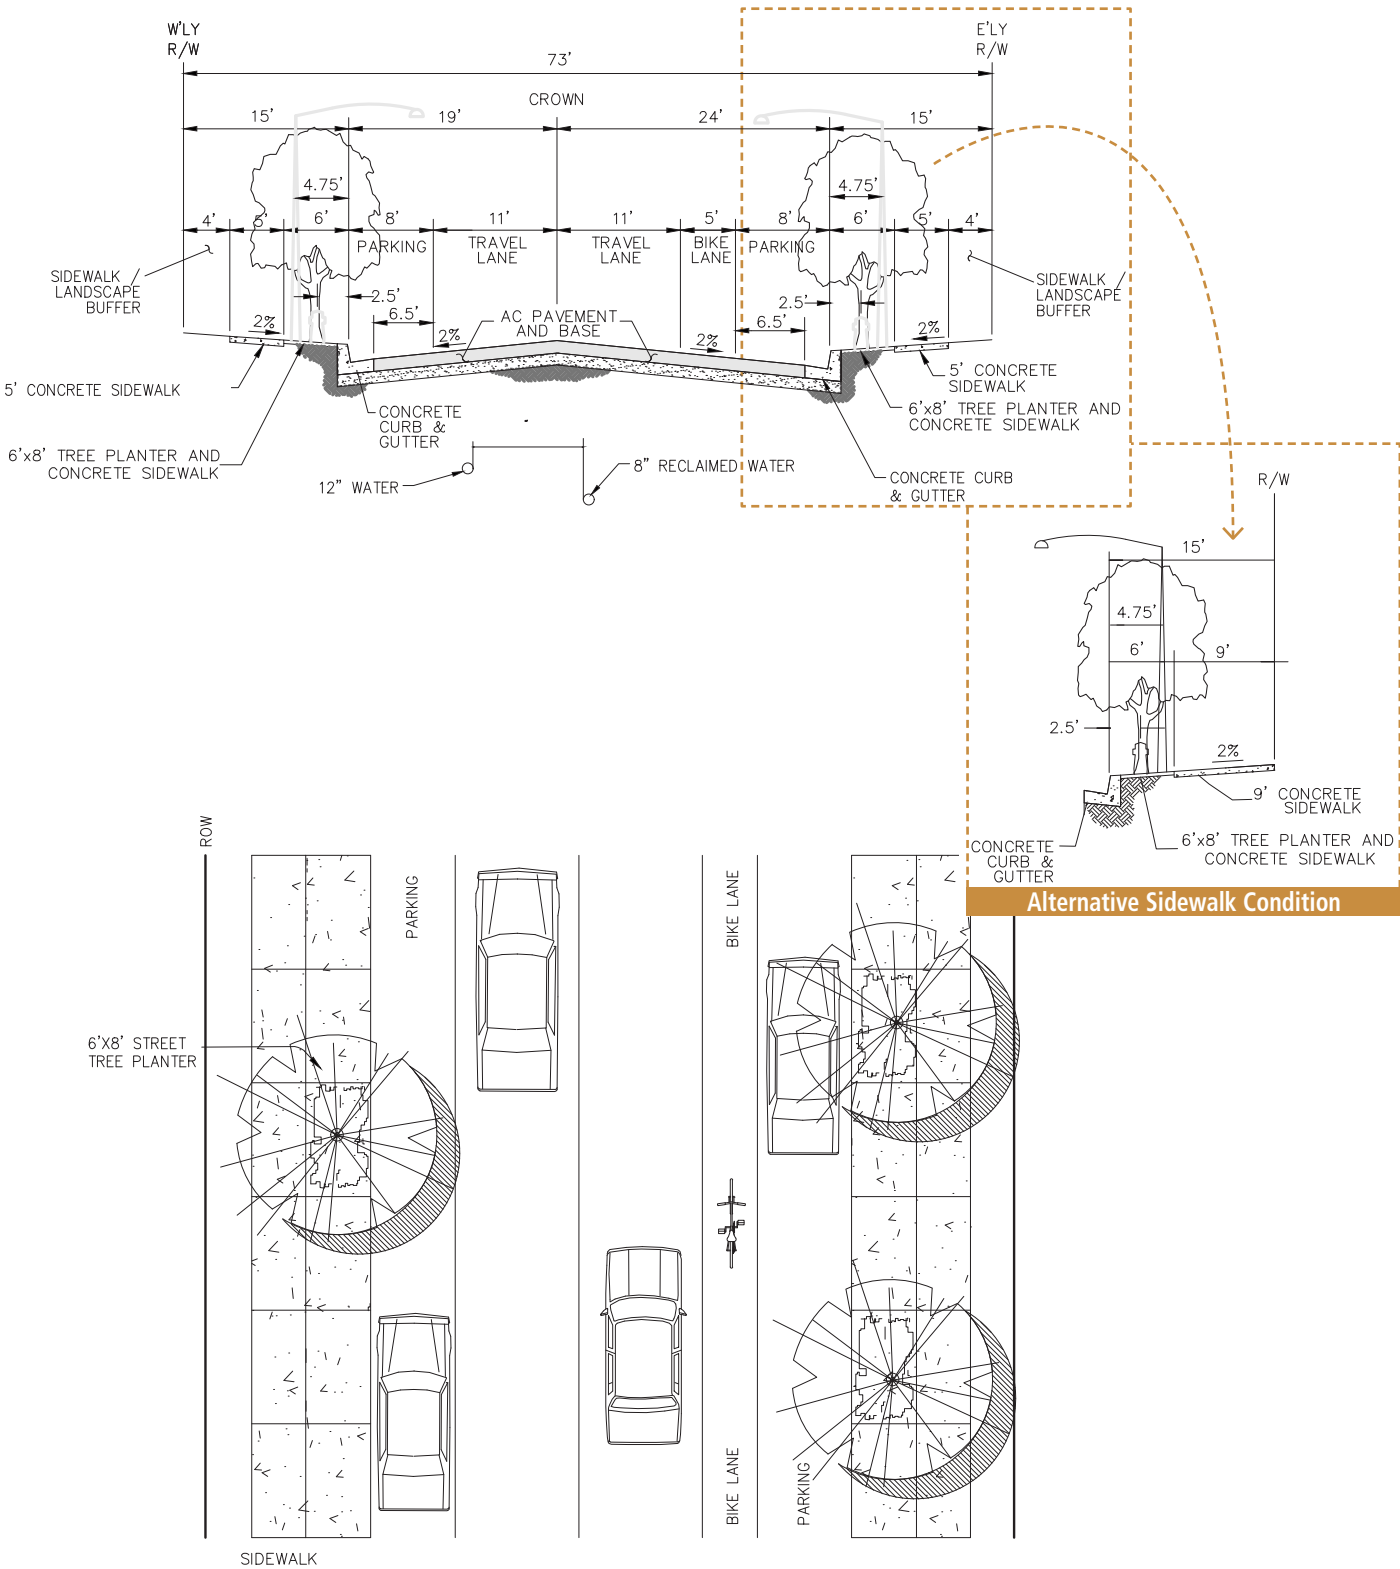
Northbound La Media Parkway (TM Street Section 2)
